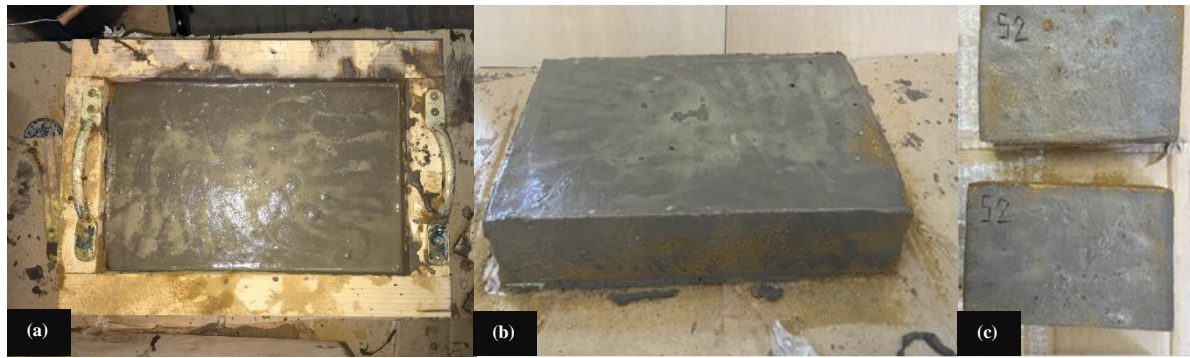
Wooden mould used to prepare: (a) Full-size British adobe bricks, (b) Full-size Sudanese adobe bricks
